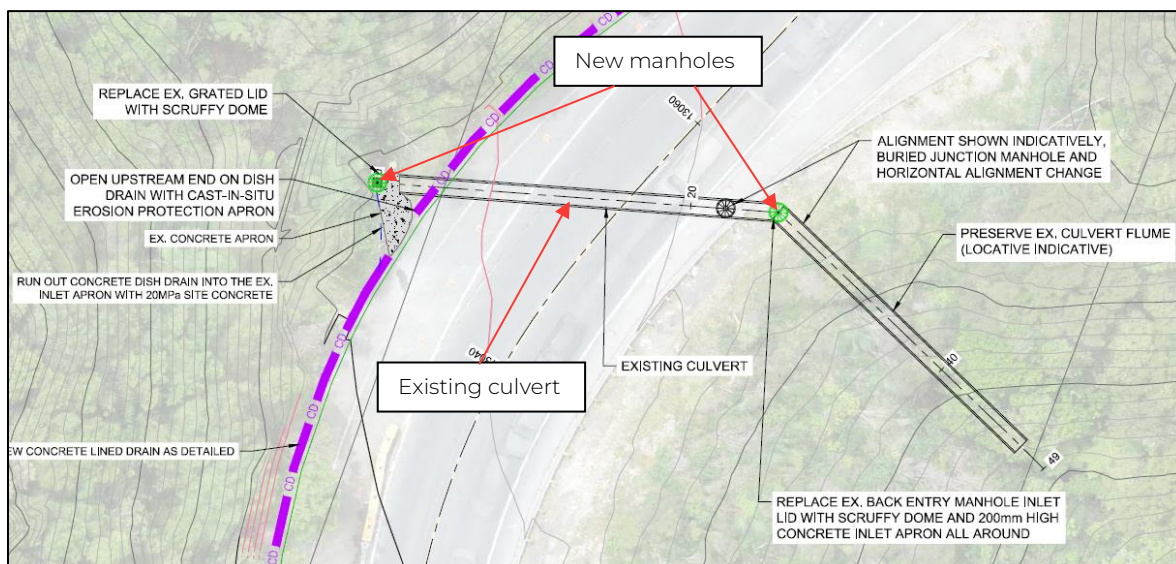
Site G3 existing culvert shown in black and manholes in green.
